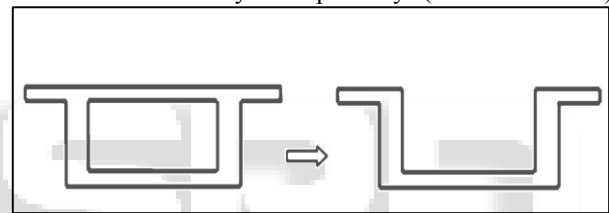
BOX GIRDER Fig. 1.2: U-GIRDER
